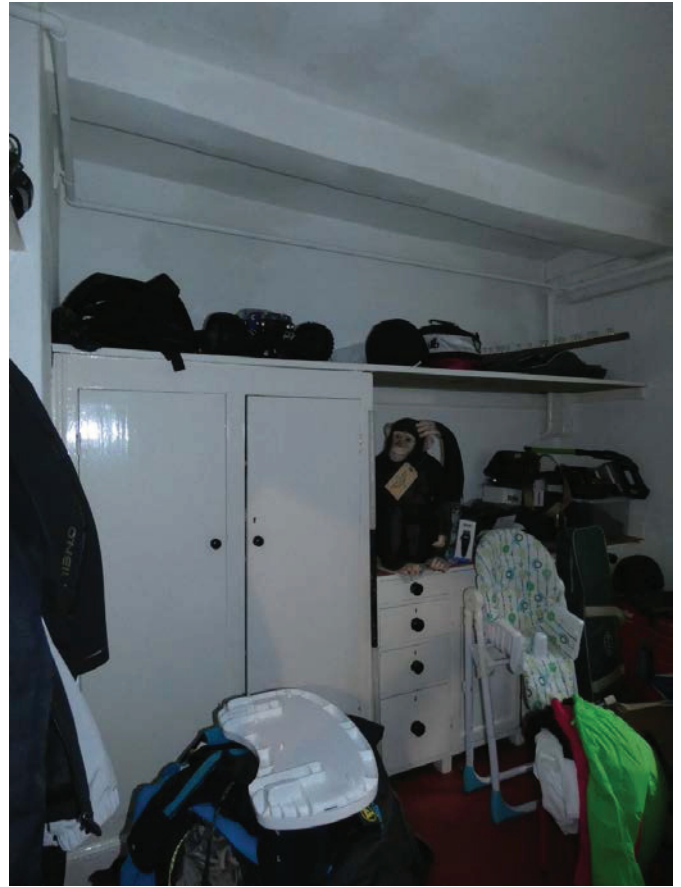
(right): Fitted cupboard against the west elevation, Room G6, viewed from the south-east
